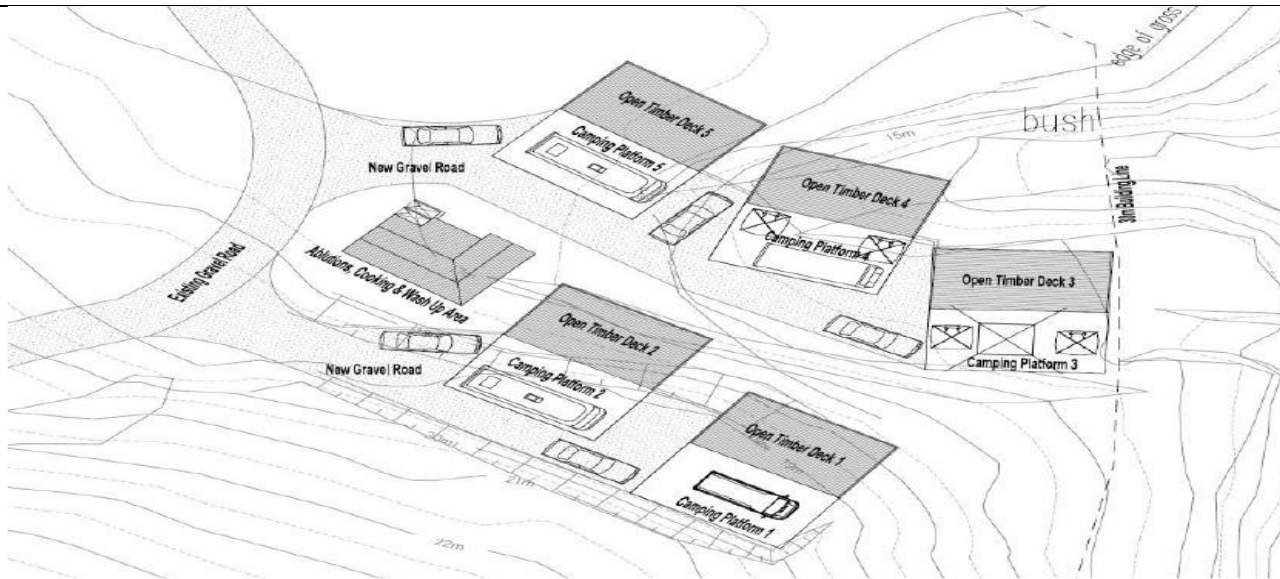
Close up layout Area 1, TMBA Architects, 2023
